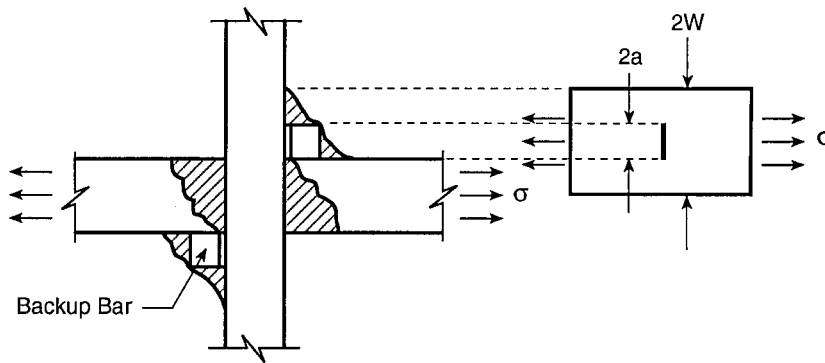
Cross-section of a one-sided groove-welded cruciform-type connection with loaded plate discontinuous and idealization of the notches from a backing bar with a fillet weld as a center-cracked tension panel.
